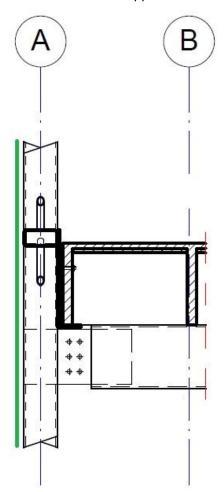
Detail 3, 1:20 (Adapted from: IMd Raadgevende Ingenieurs)
